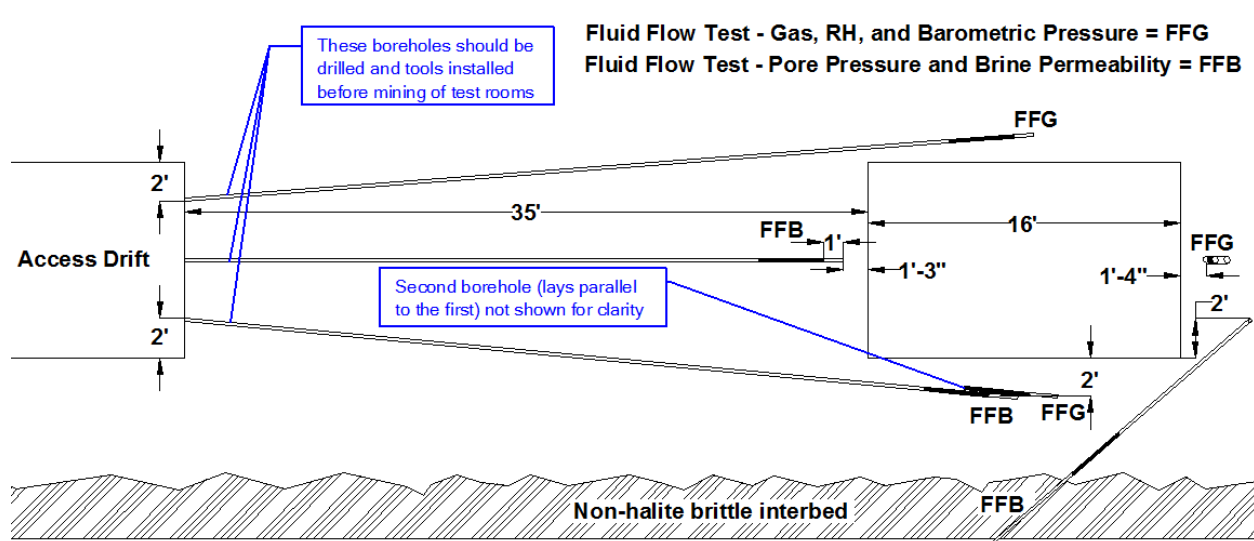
Layout of Fluid Flow Test Systems Around Typical Test Room
